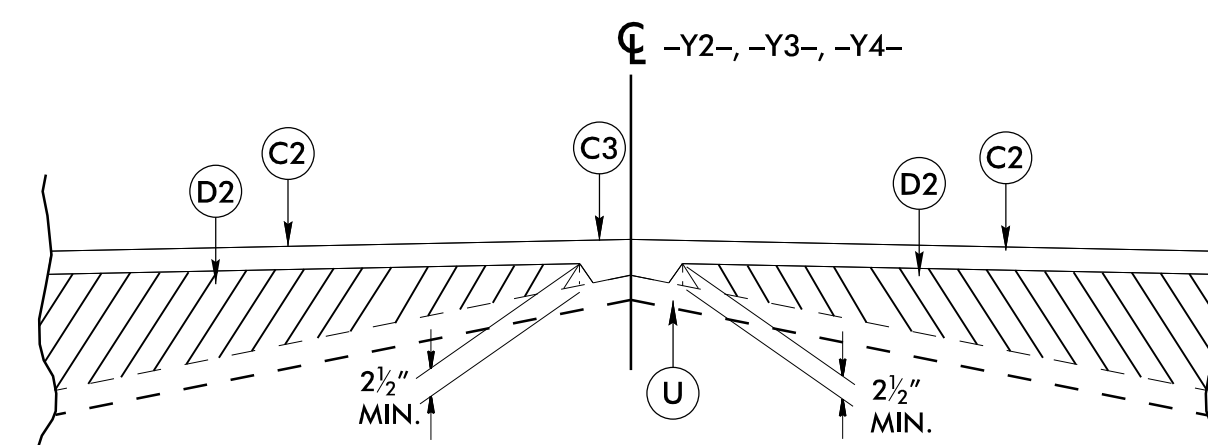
"-1.5" Milling At Pavement Tie-Ins
